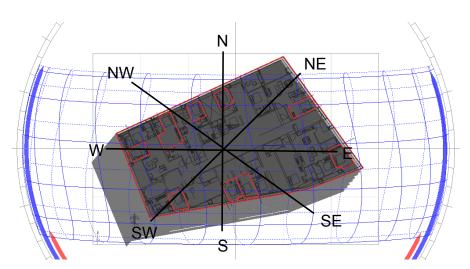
h Typical floor plan Solar penetration on 21 June
